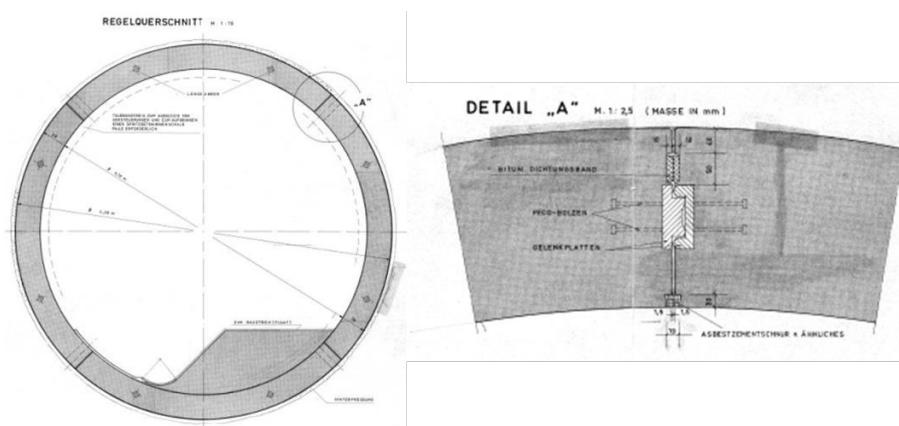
Cross-section (left) and longitudinal joint (right) of HWS
